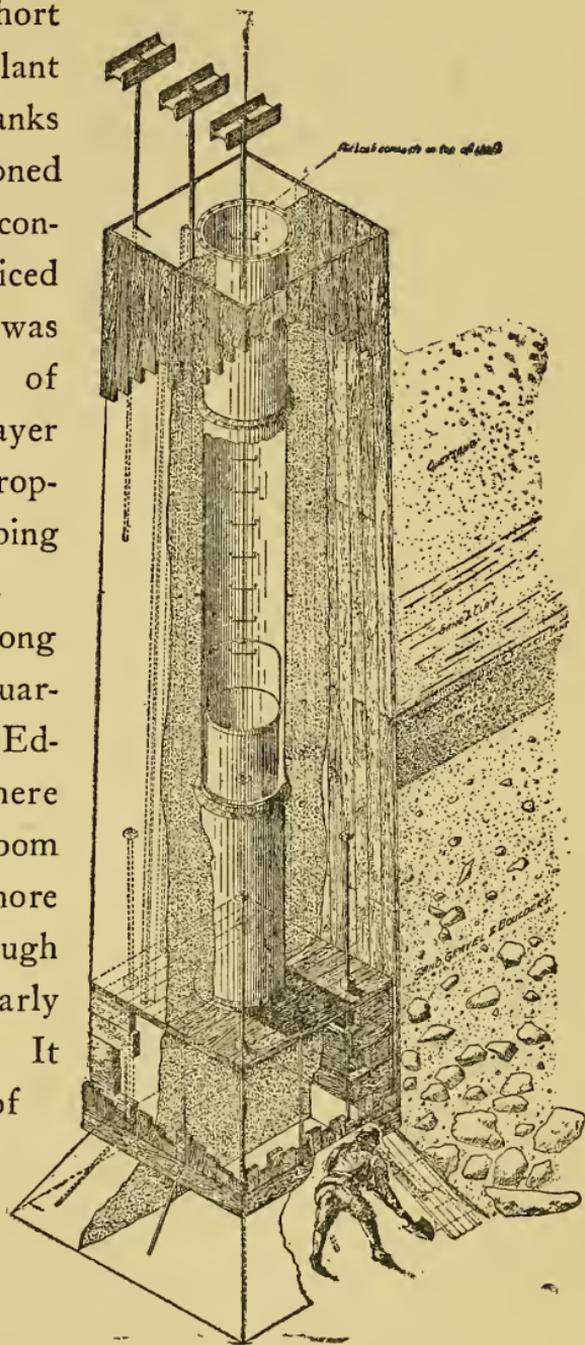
MAKING A FLARED FOOTING FOR A CONCRETE COLUMN.
